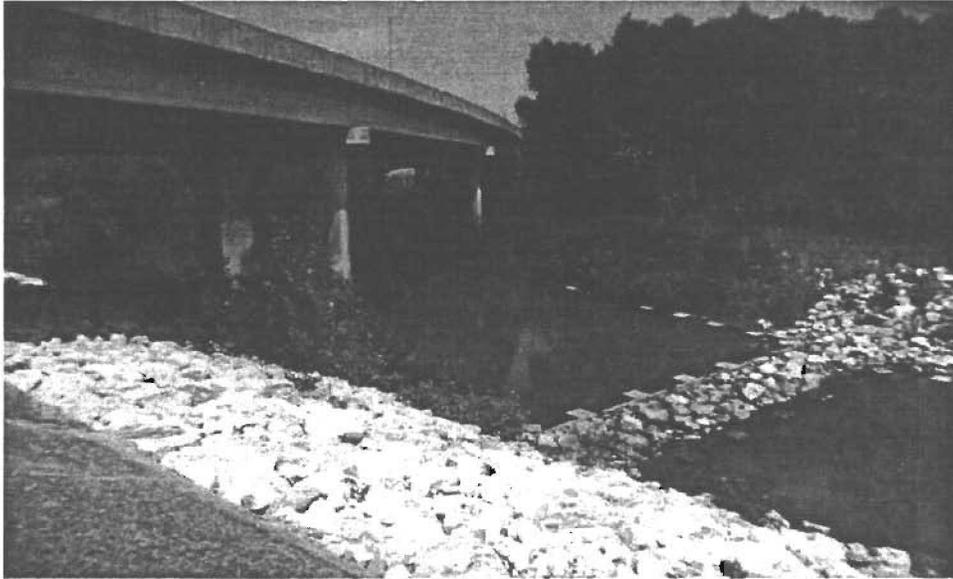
Grade control structure and riprap on south abutment to protect against channel flows impinging on the abutment.
